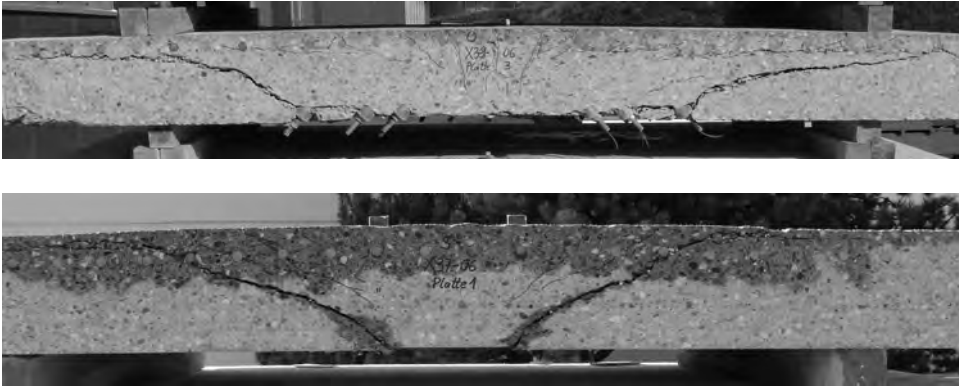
Failure patterns with and without post-installed punching shear reinforcement [11]
